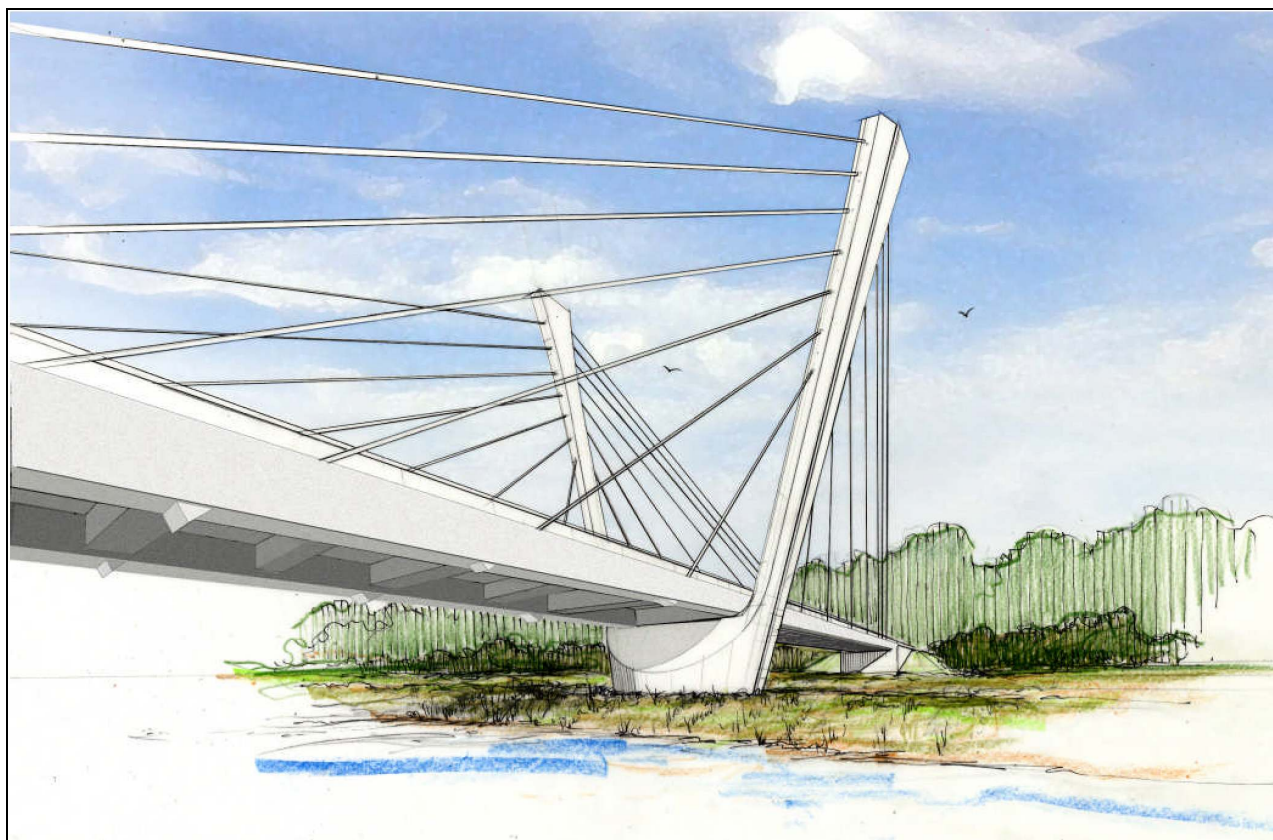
New Bridge Indicative Sketch looking from the Promenade downstream, looking from the south west to the northeast
